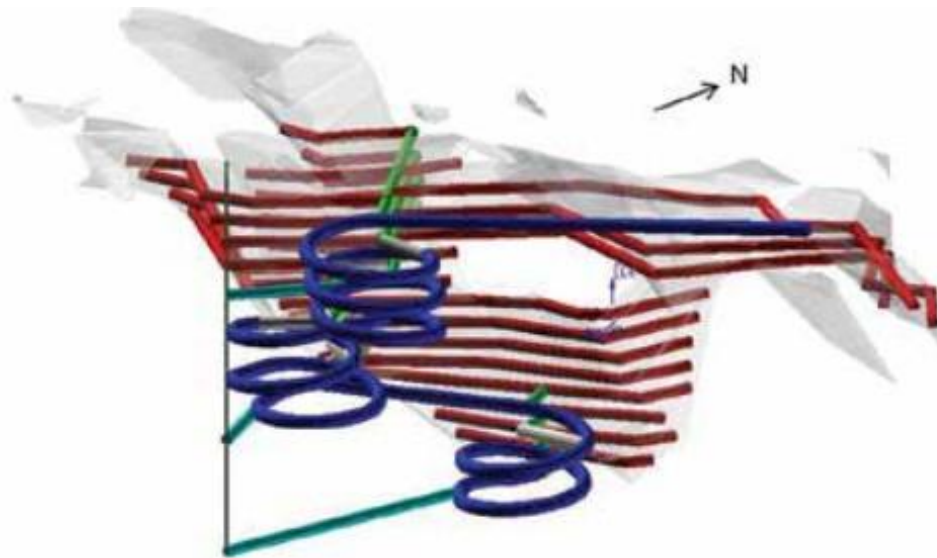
Overview of the planned drifts and the ventilation hole in orebody A (turquoise: connection from ventilation hole and grey: connection from the ramp, dark blue: spiral ramp, dark green: ventilation hole, red: stope drifts, green: cross cut drifts) (Wolf et al., 2018).
